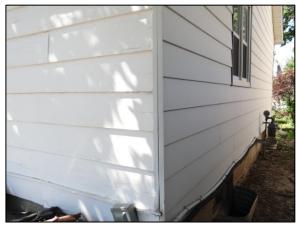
Clapboard on the northeast elevation and aluminum siding on the northwest elevation.
